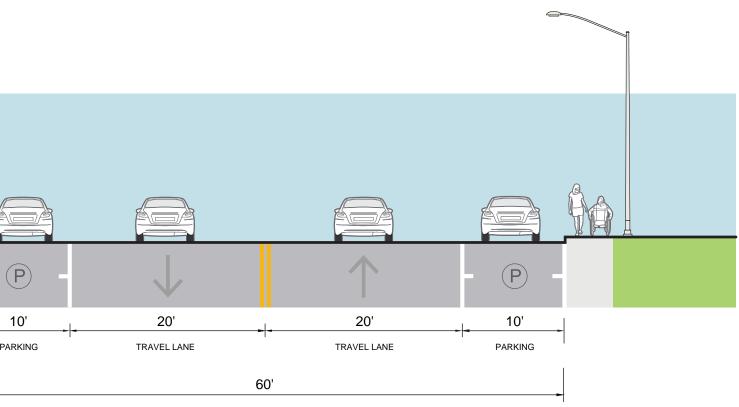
Existing Conditions/No Build Section – 60-Foot Segment
